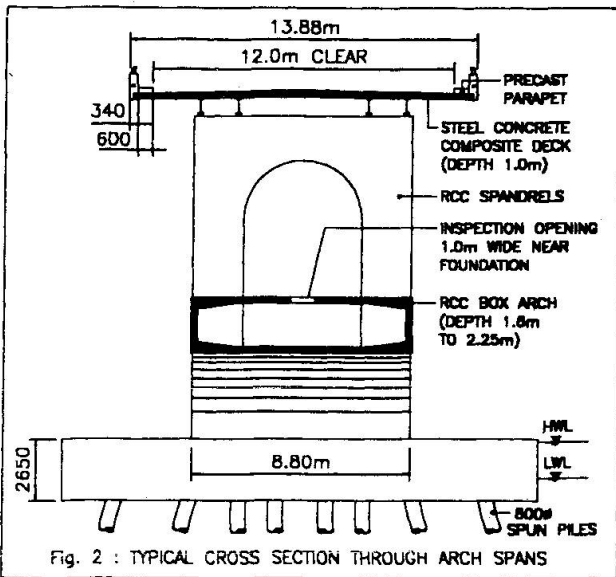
TYPICAL CROSS SECTION THROUGH ARCH SPANS
